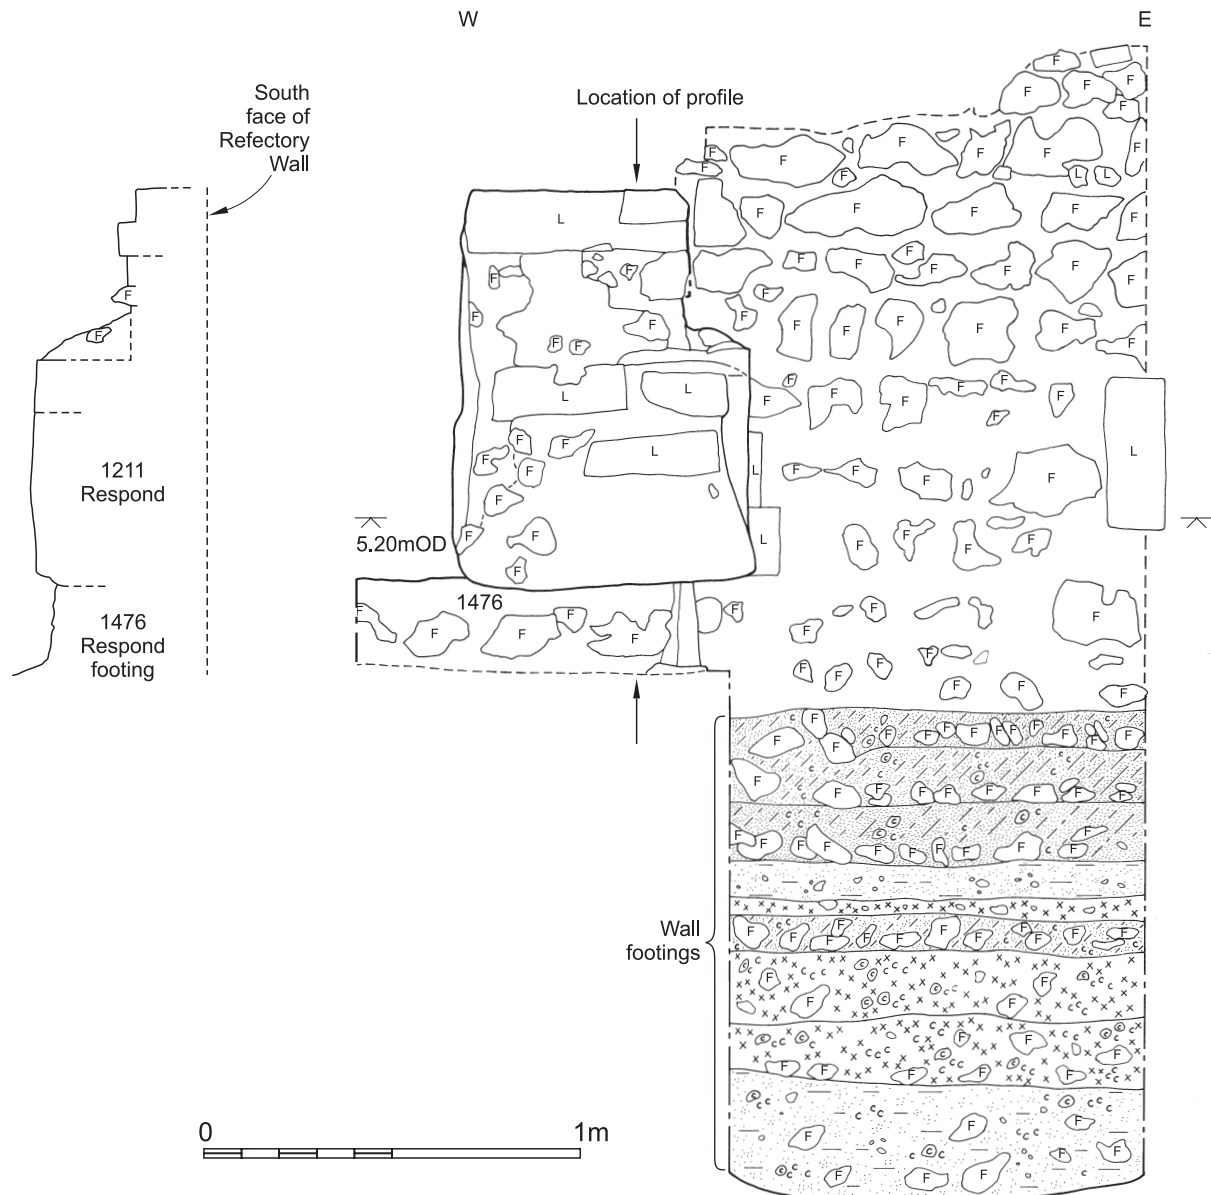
Section: Northern respond base and wall footings. South facing, with east facing profile on left. Scale 1:20
